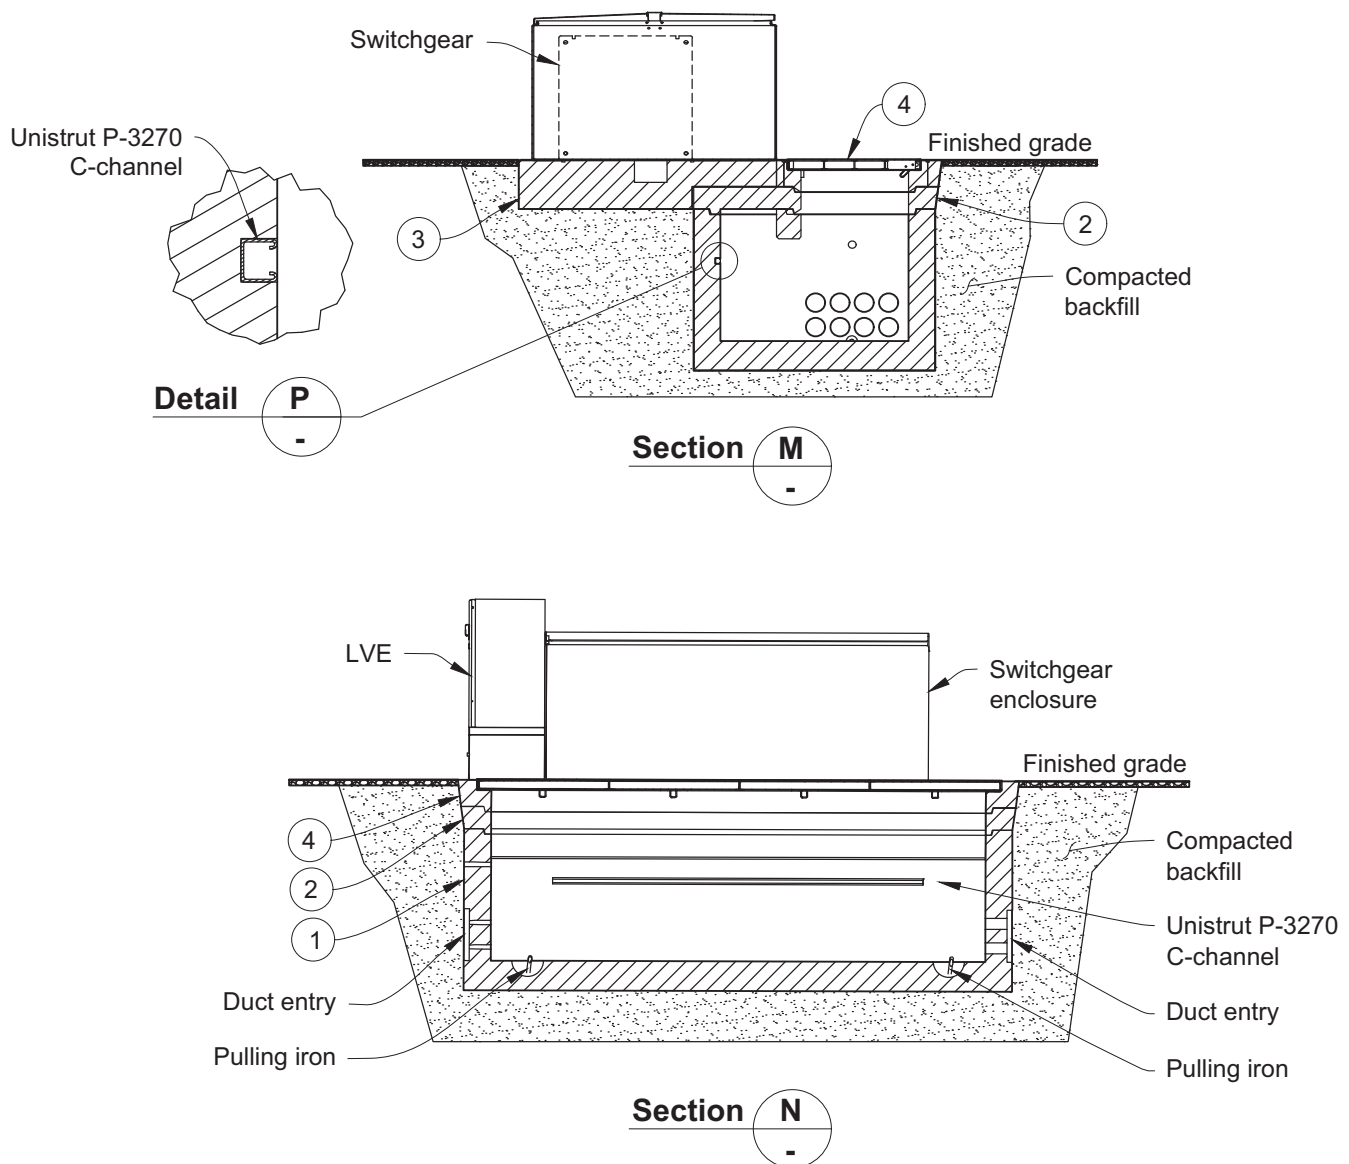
Above ground over-pad 4-way and 5-way switchgear section views
